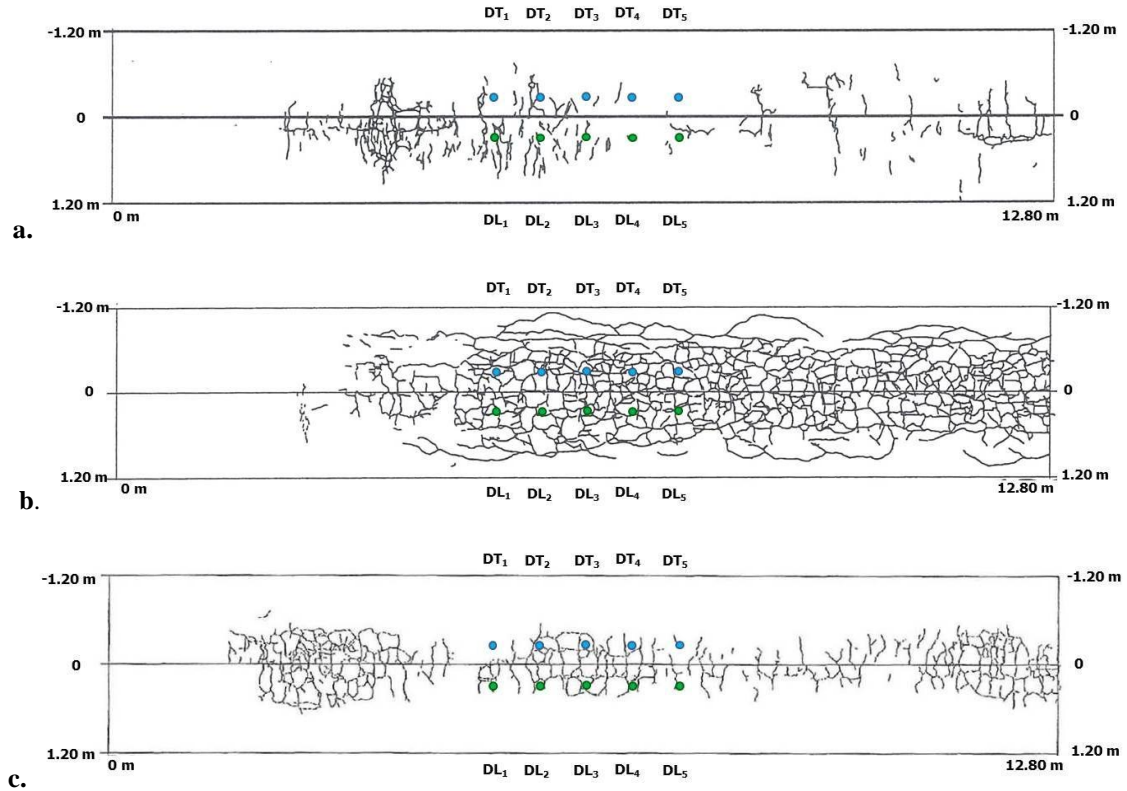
(a) Crack pattern of Lintrack section I after 4 Million cycles, wheel load 75 kN, 150 mm thickness. (b) section VA after 650 kilocycles, wheel load 75 kN, 80 mm thickness. (c) section VB after 1722 kilocycles, wheel load 50 kN, 80 mm thickness [1, 4]
